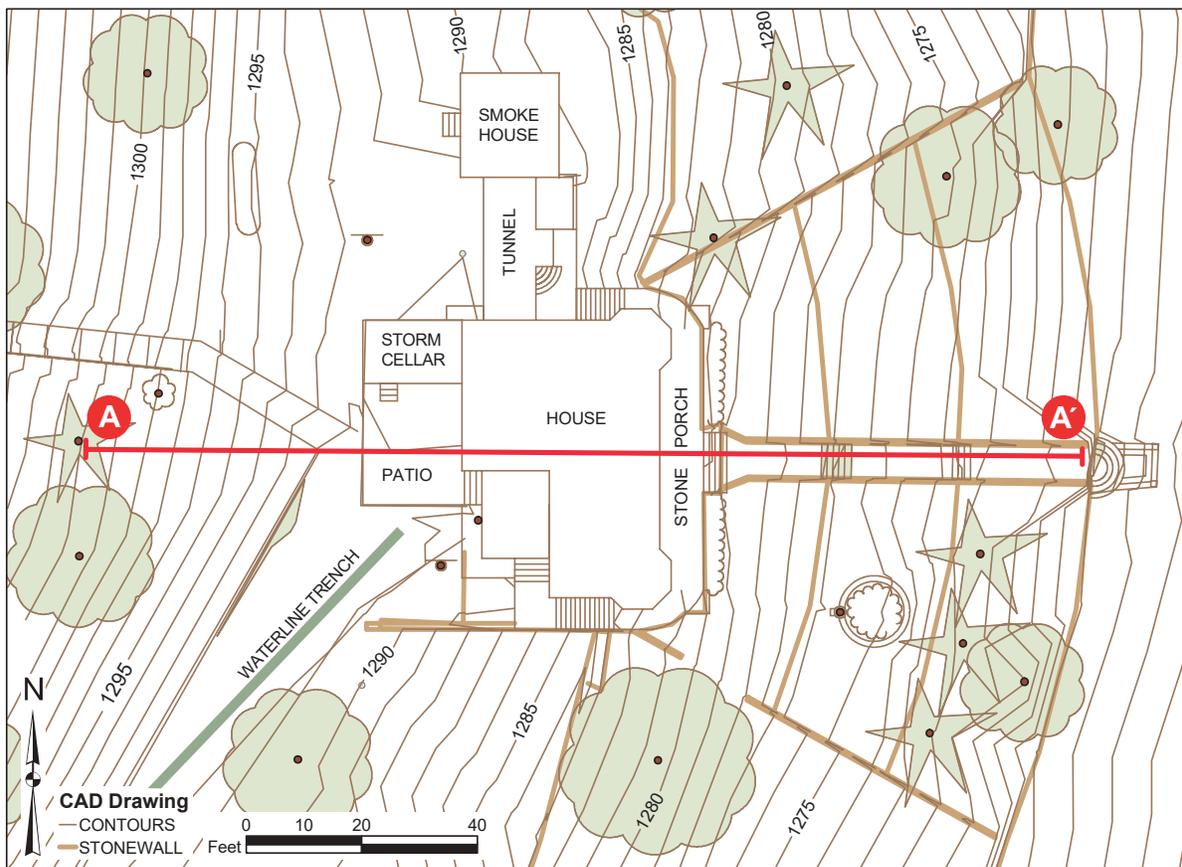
Map of the Ranch House area from the Water Improvements plan showing the location of Cross Section A-A'.
